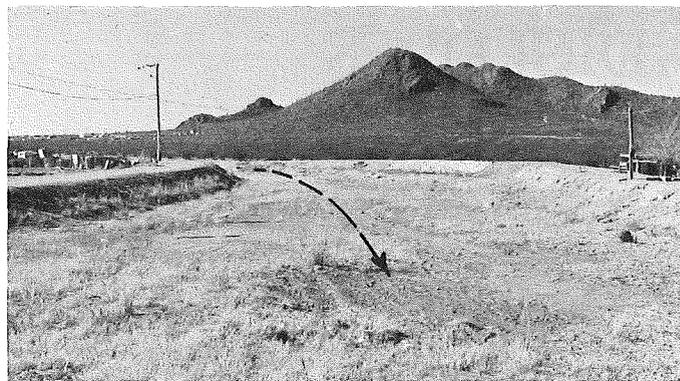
Man-made drainage system designed to channel sheetflood waters collected by a dike erected on a planar slope at the upper edge of a residential area. Looking westerly, upslope, southern end Tucson Mountains, 1975.
